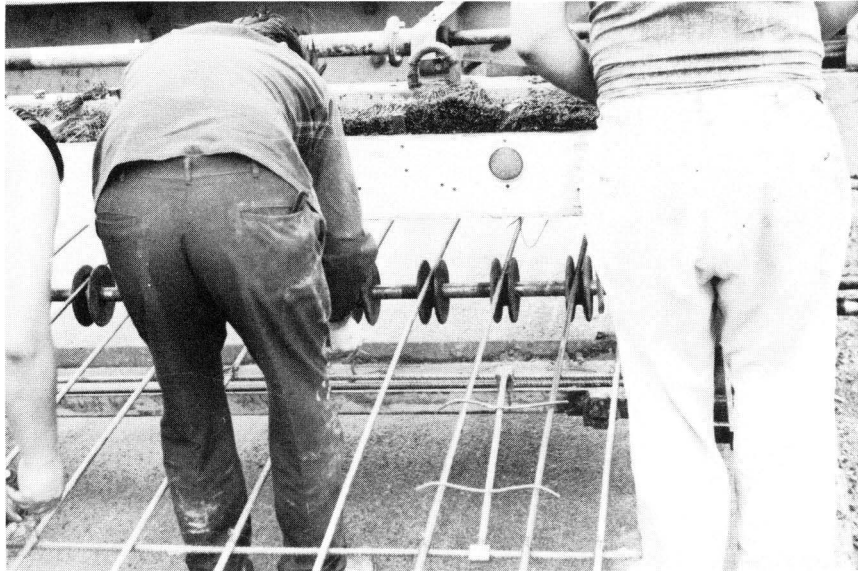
GAGE AND PULLEYS USED FOR SPACING TRANSVERSE AND LONGITUDINAL STEEL, RESPECTIVELY.
